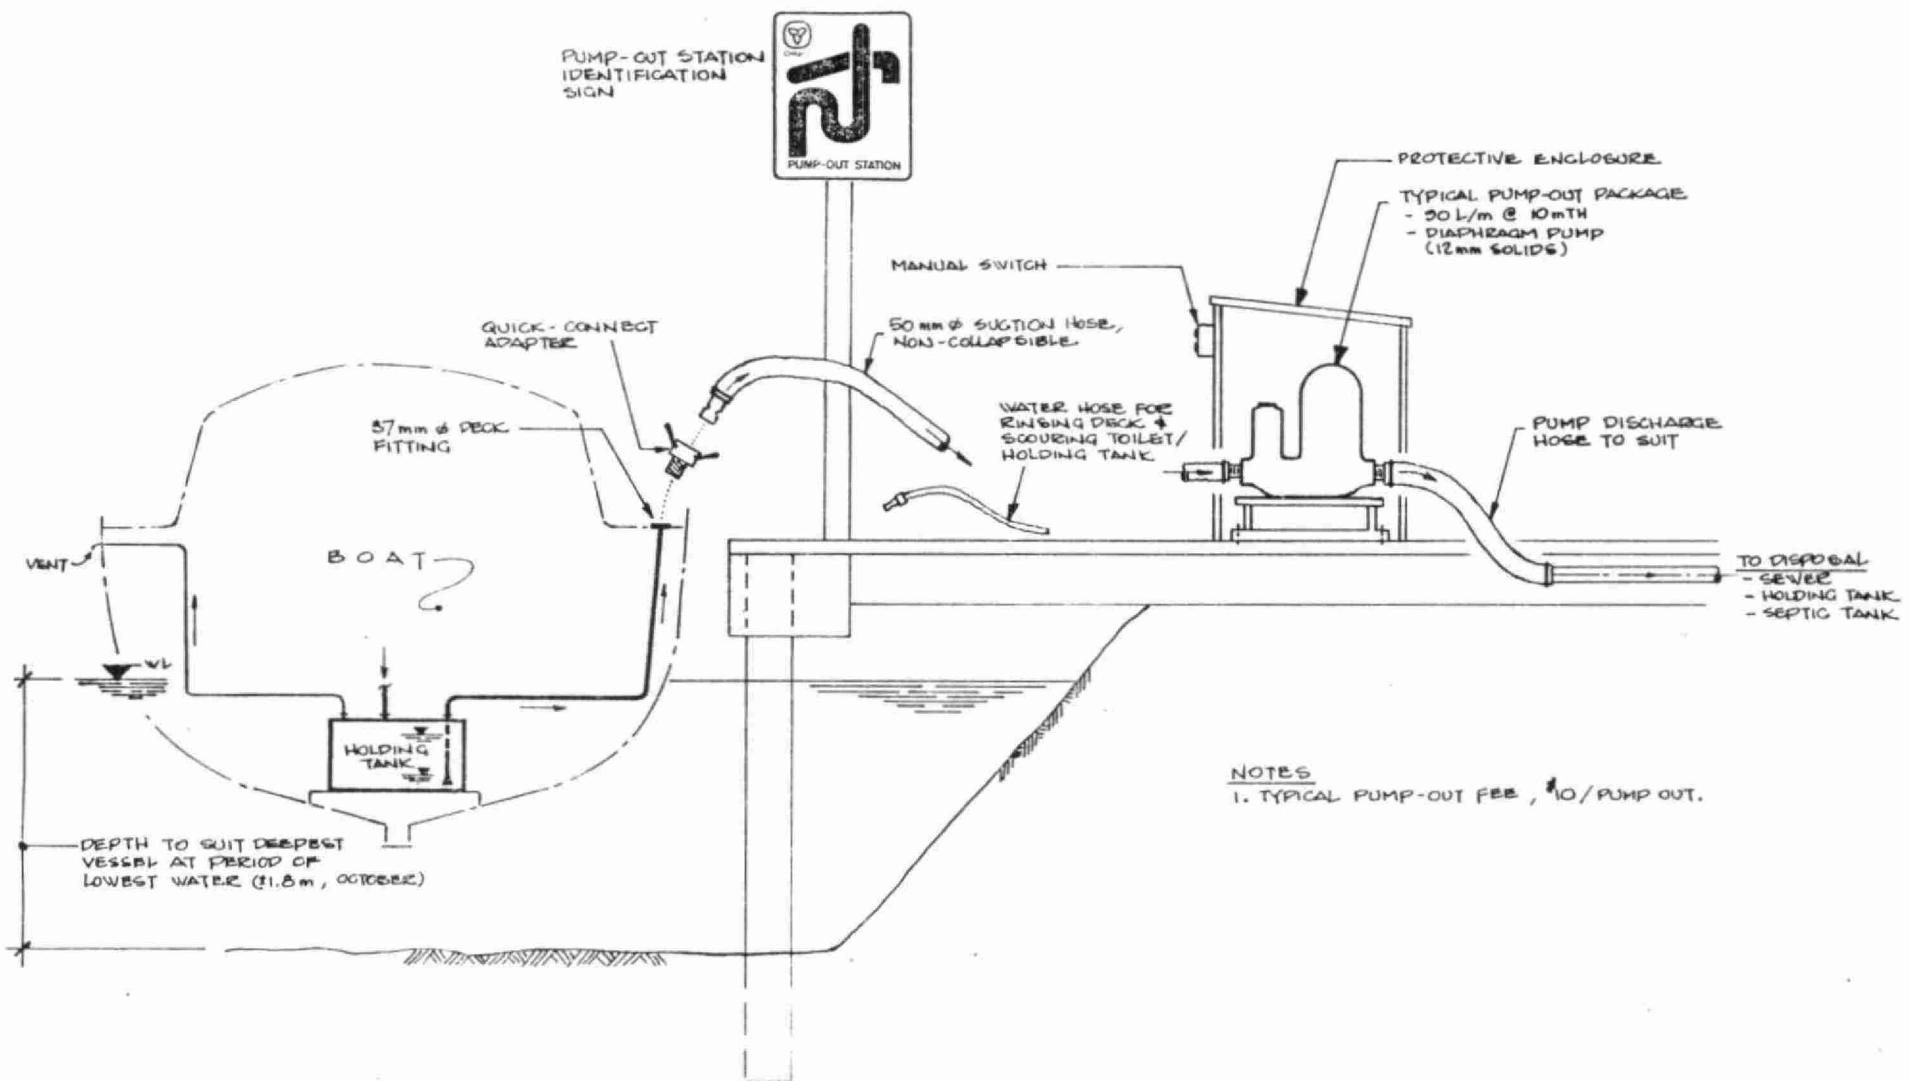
TYPICAL MARINA BOAT PUMP-OUT FACILITY
